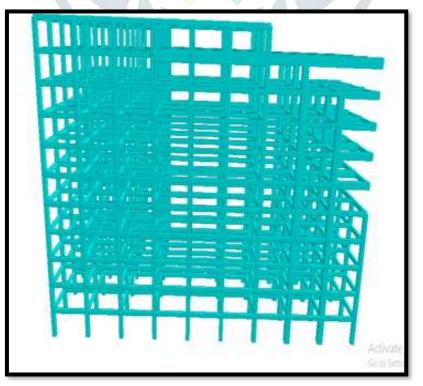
Isometric view of Unsymmetrical structure with cantilever section model.
